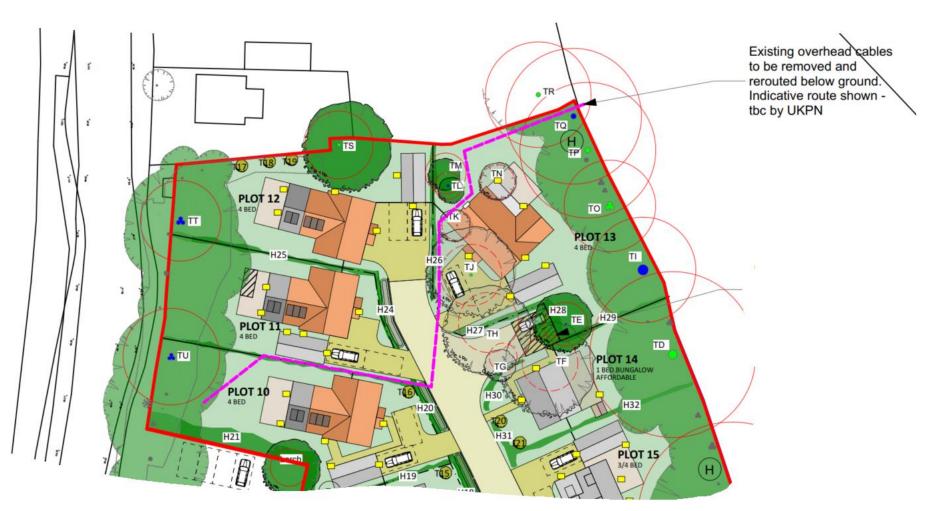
Extract from the site layout plan showing the proposed diversion of existing overhead power lines.
